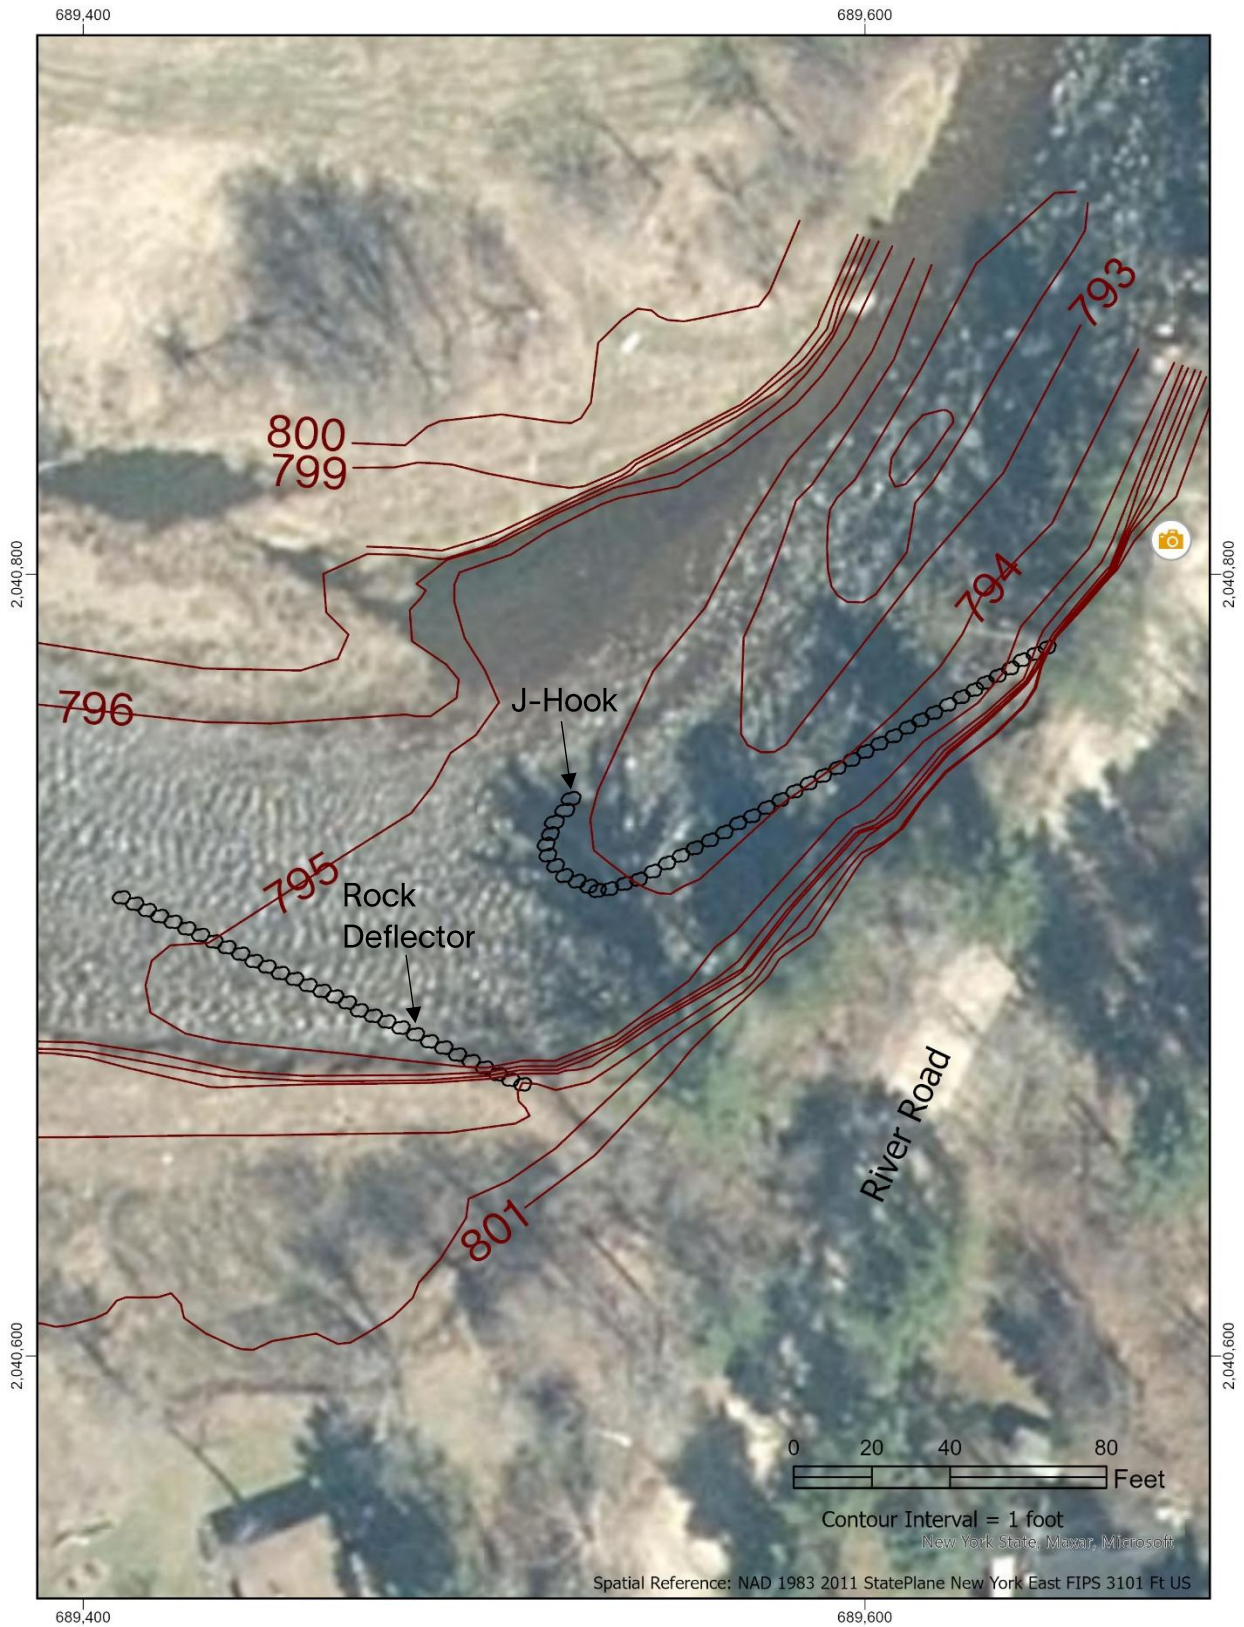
Layout of design for bank stabilization. Elevation contours show existing conditions. Rock vanes tie into existing bank elevations.
